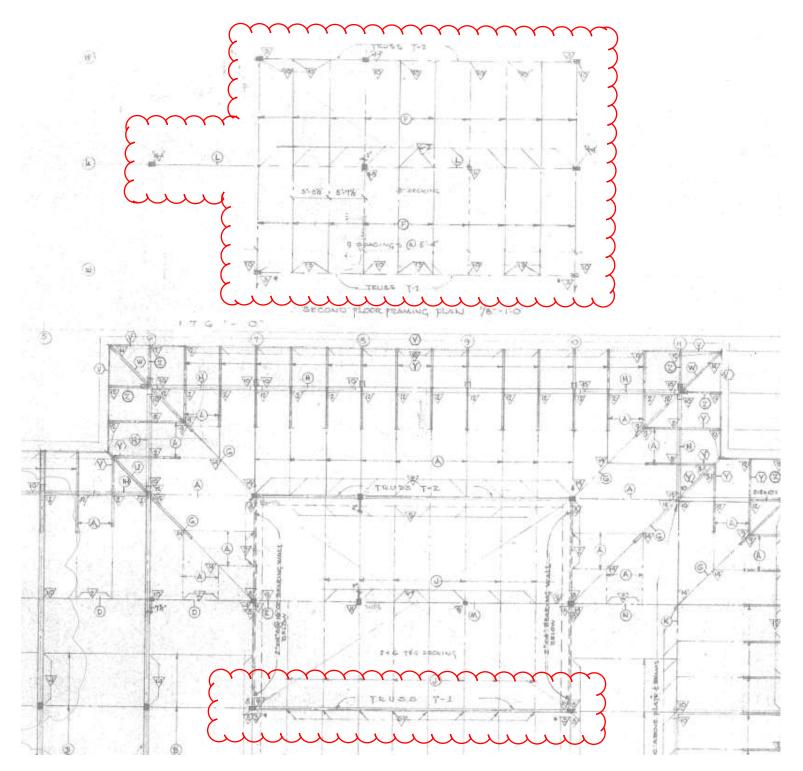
Original Roof and Second Floor Framing at Deficient Members
